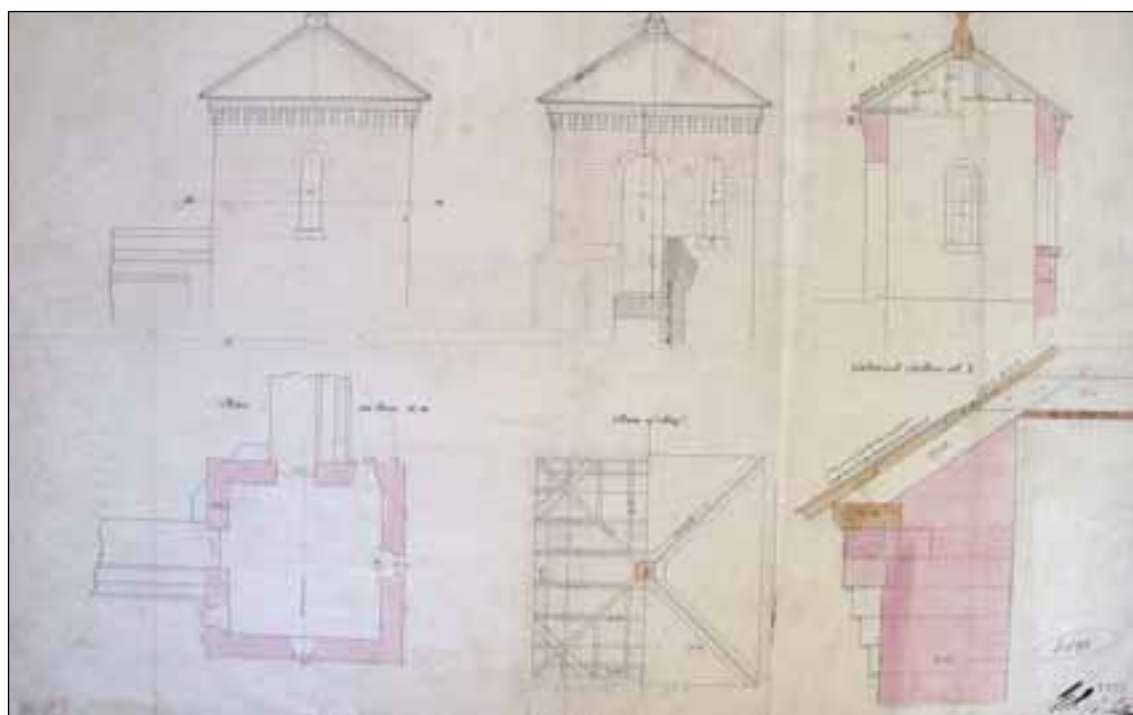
Late 19th century plan of the sentry towers (EHA MD 95/6516)
